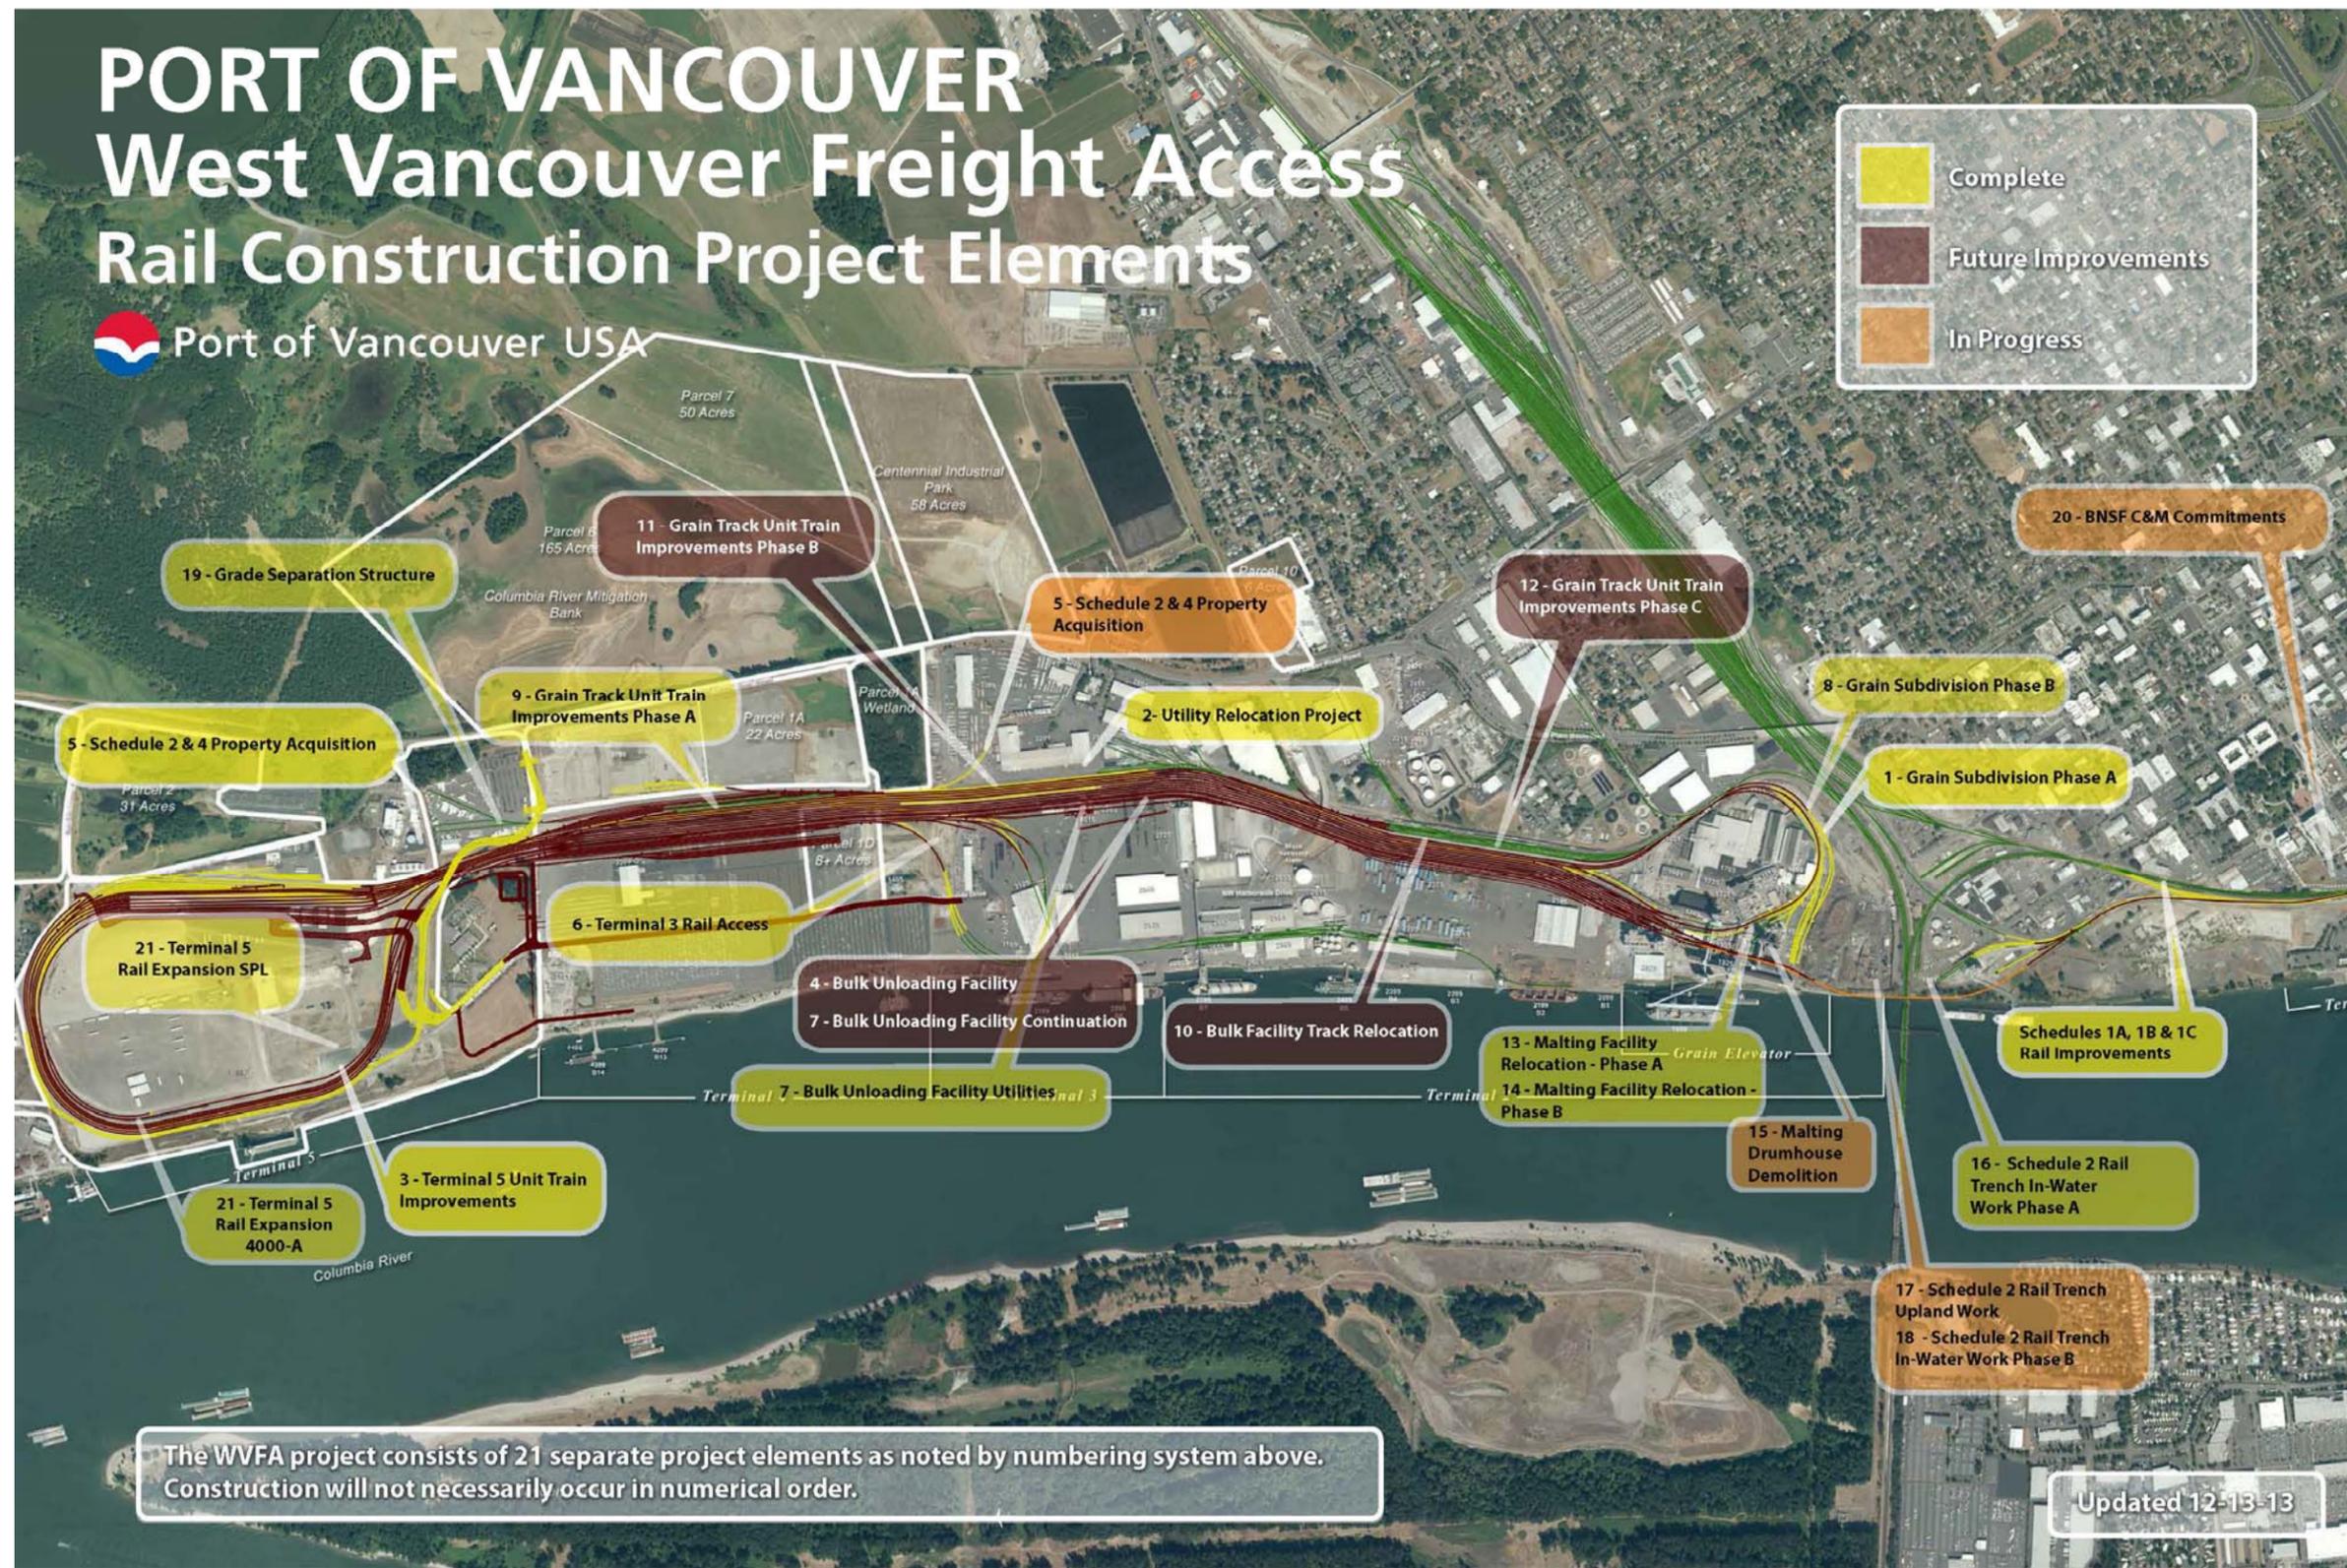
WVFA Rail Construction Project Elements (Revised)
